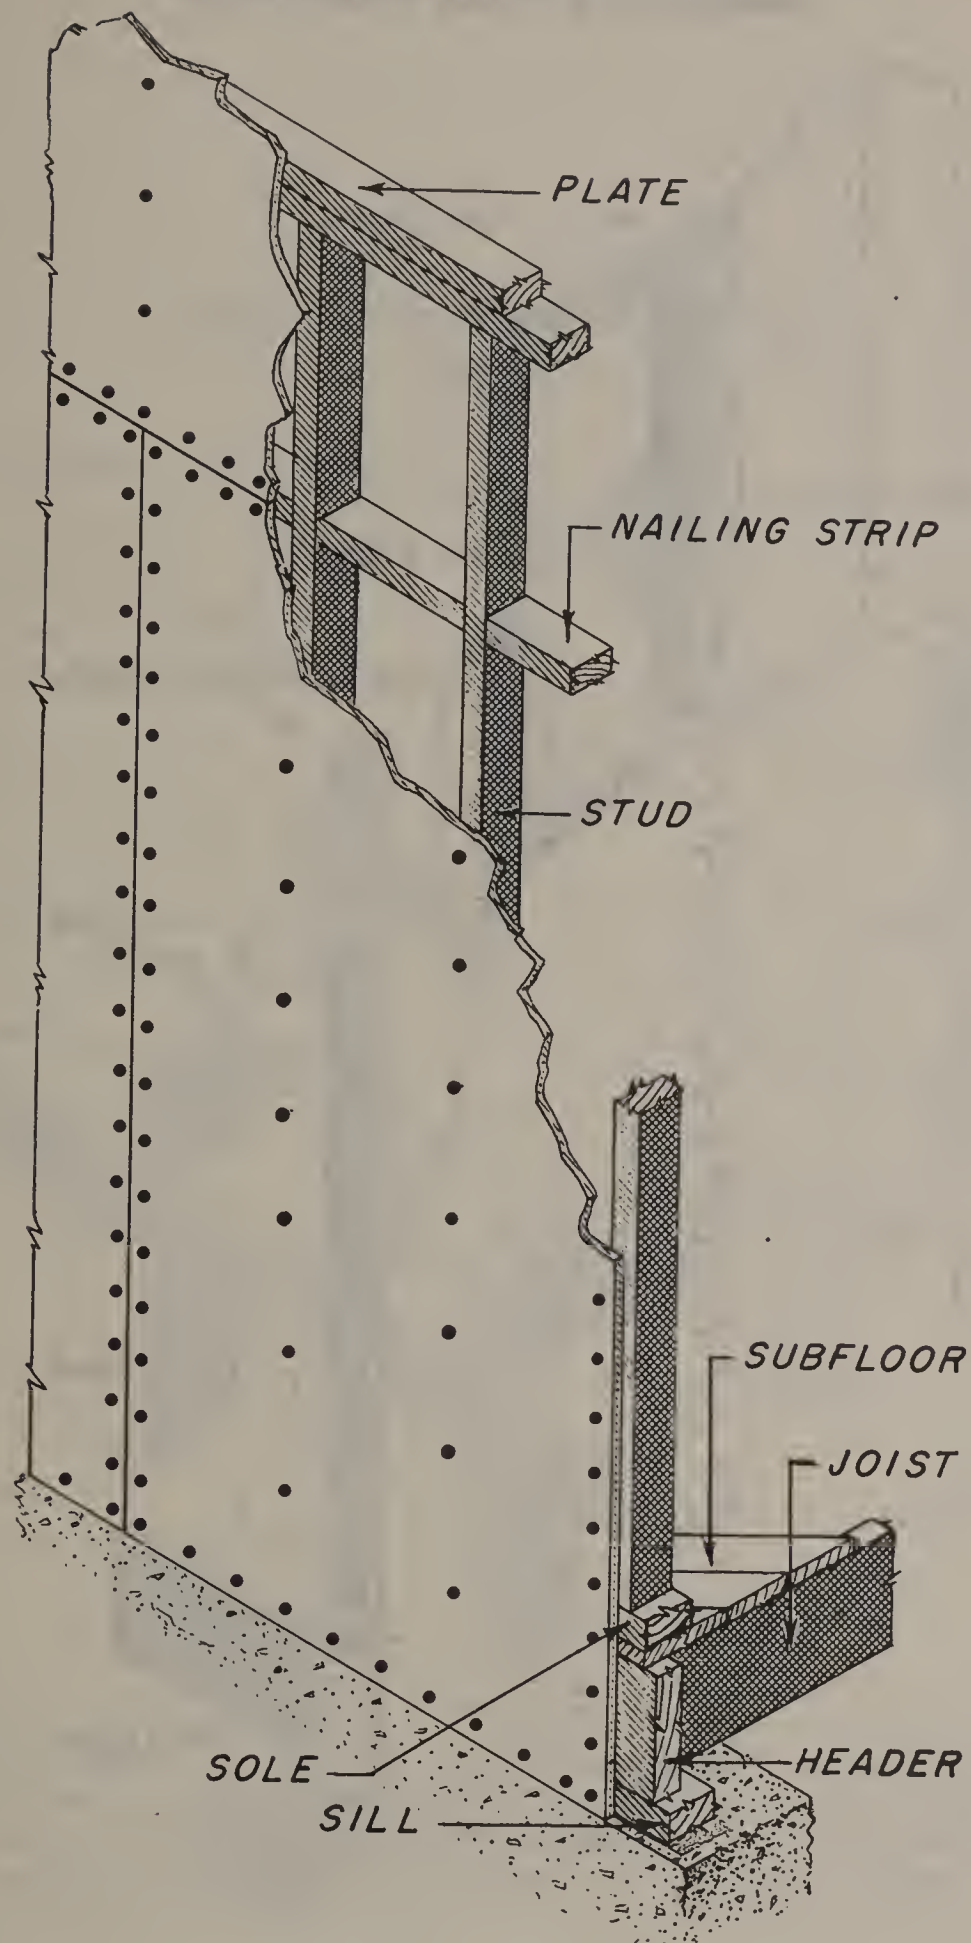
Plywood wall sheathing. Plywood less than one-half inch in thickness nailed with sixpenny nails spaced 5 inches on centers along edges and 10 inches on intermediate framing members. Plywood one-half inch or thicker nailed with eight-penny nails at same spacings. Note: Vertical joints between plywood sheets should not be on the same stud or joist in succeeding rows of sheathing. For the horizontal joints nailing strips are set between the studs and nailed to them.
